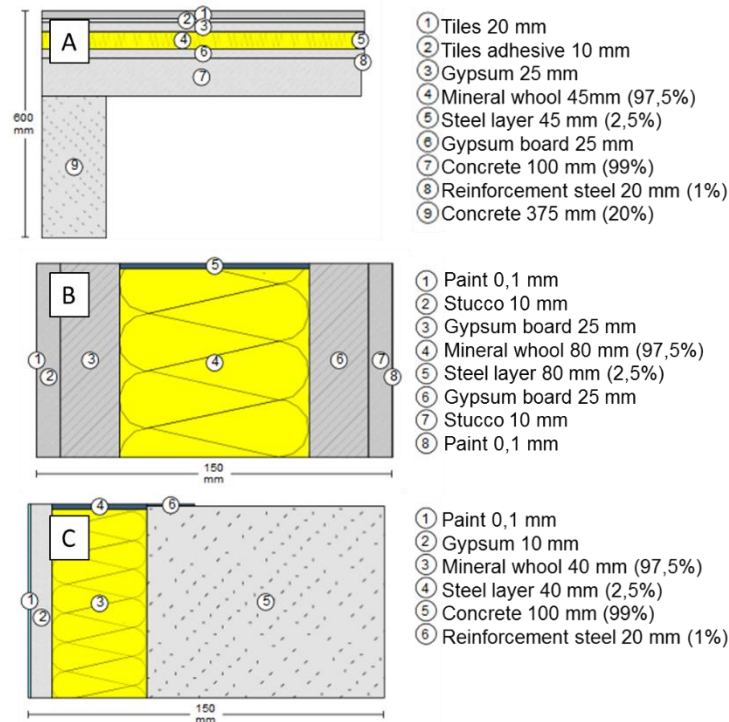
Common structures configuration of CONTREE: A. Apartment's floor B. Inner walls C. Outer walls
